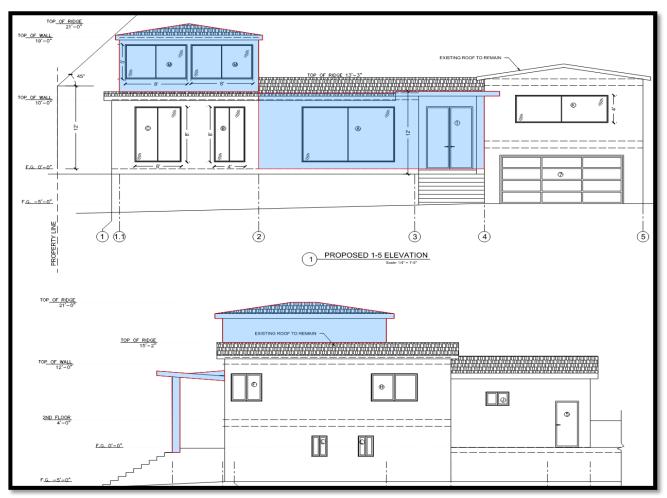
North (Top) and West (Bottom) elevation plans of the proposed development with first and second story additions.
